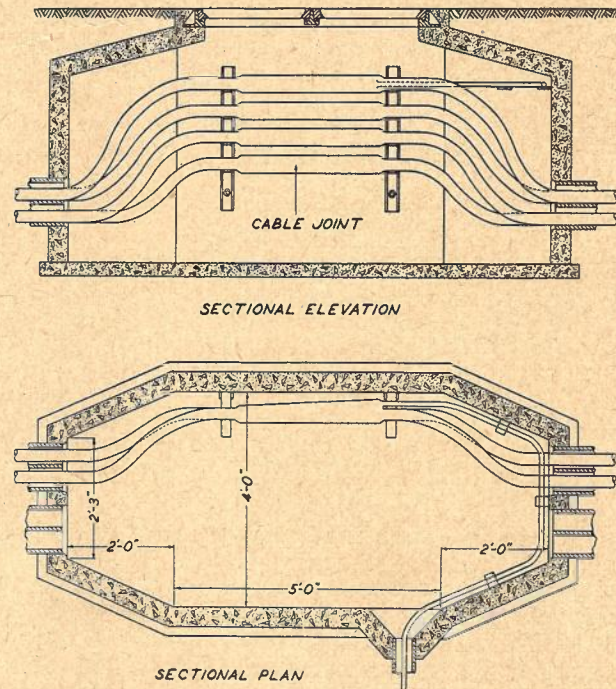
Suggested Manhole for up to eight Ducts. (Cables shown on one wall only, but arrangement on other wall will be similar.)
